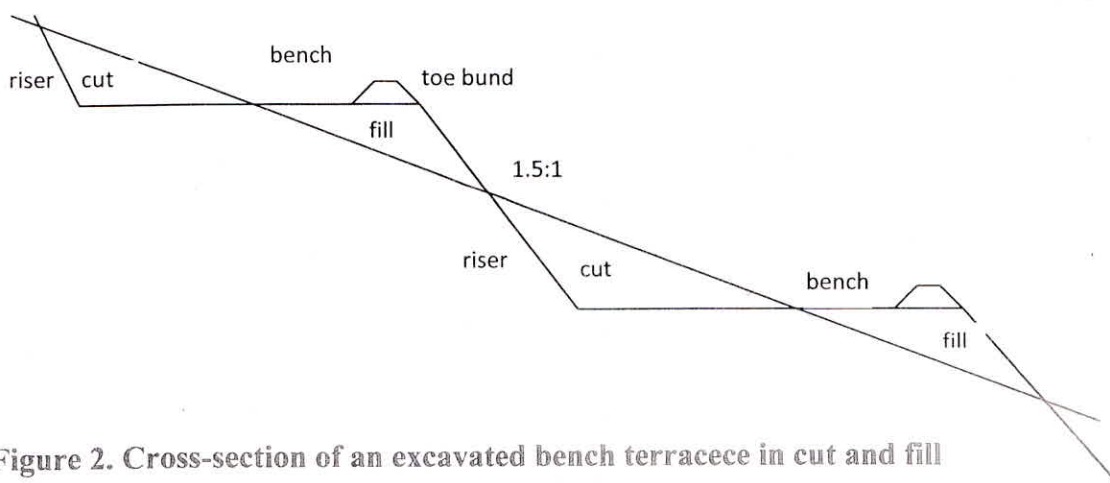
Cross-section of an excavated bench terrace in cut and fill
